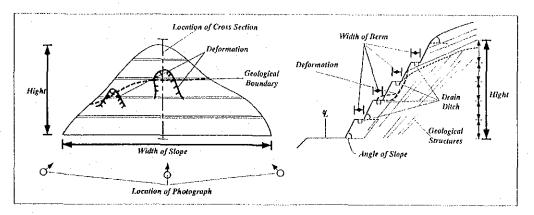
Basic slope information to be on the Form B (Sketch of Slope)
